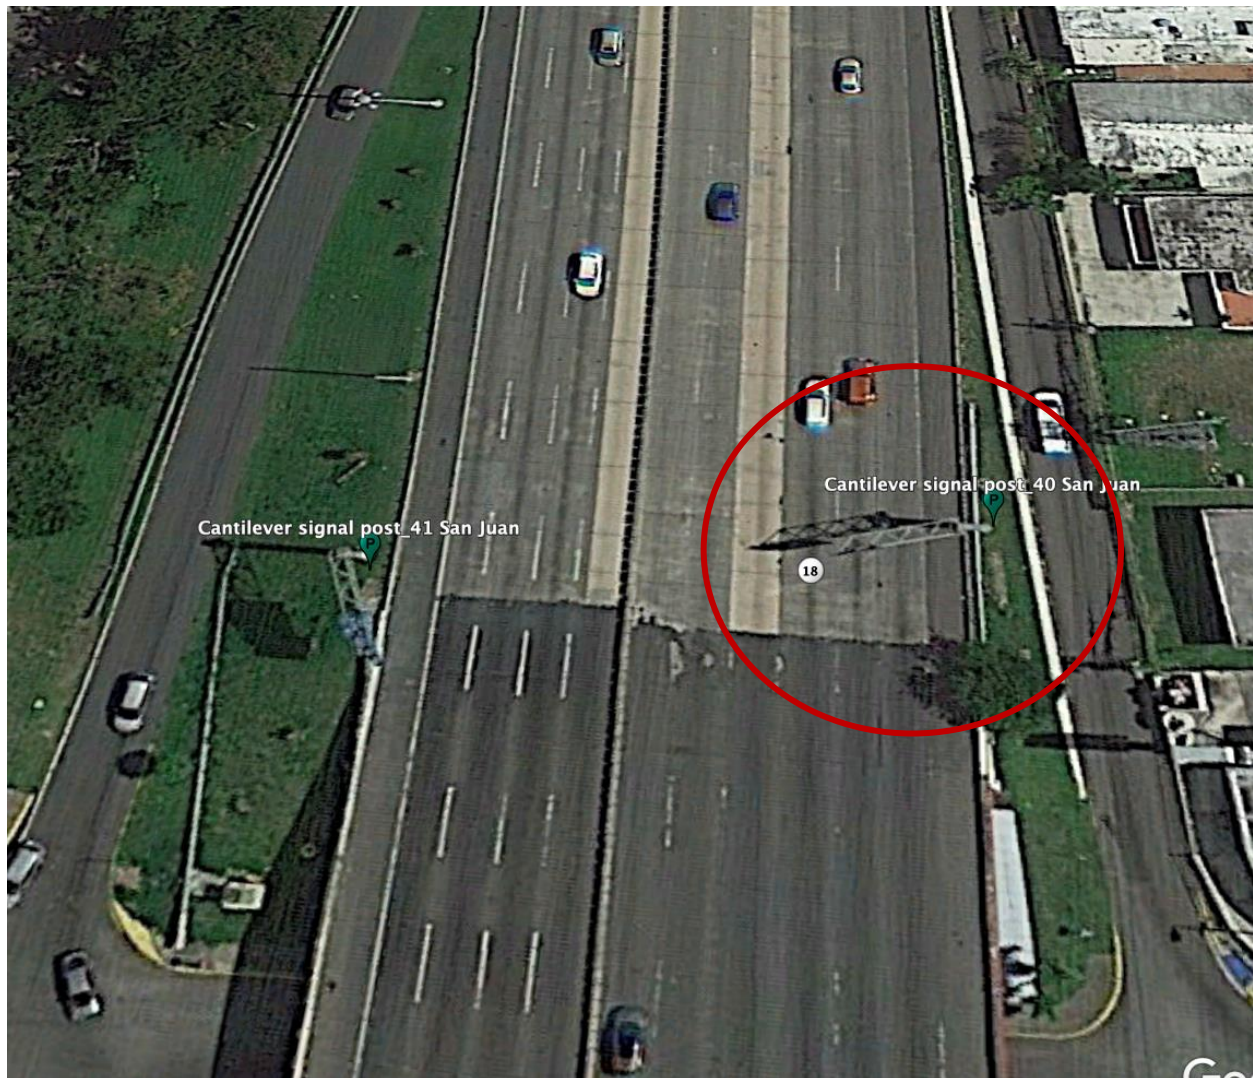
Satellite Image of Cantilever Sign Soil Foundation Failure (Torsional Rotation) at P- 40 Photo Location: 18.413125°N; 66.06986944°W
